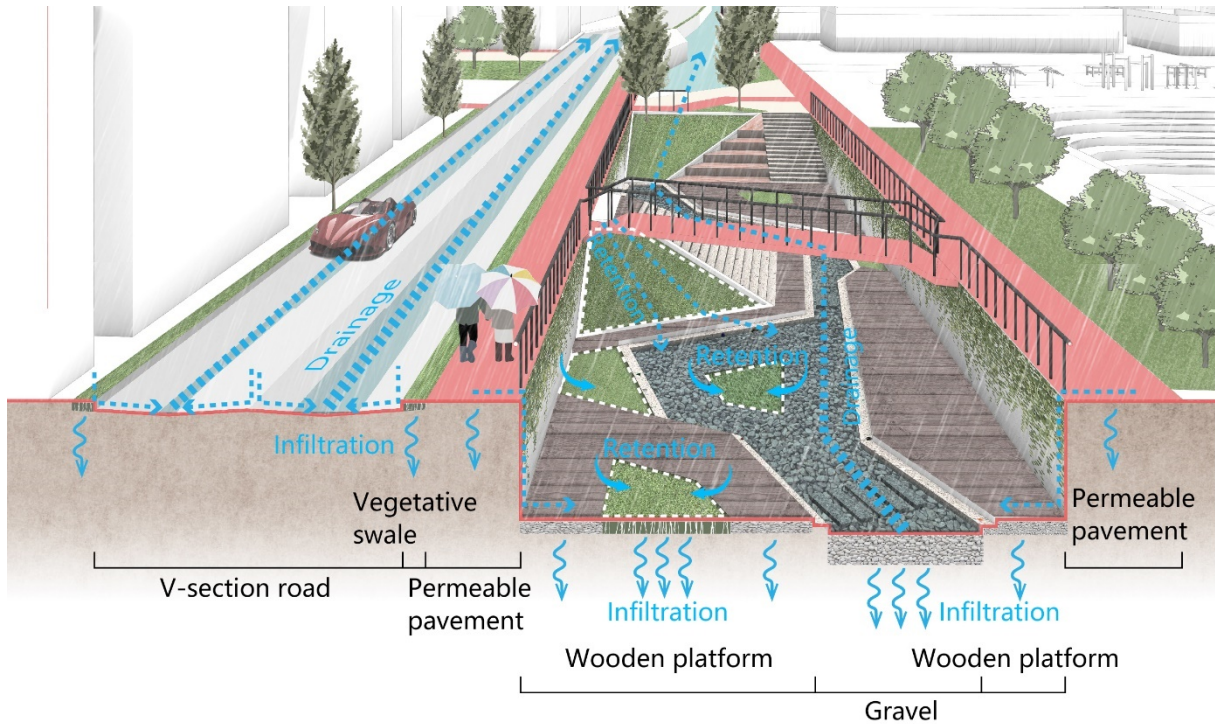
Resilient stormwater management mechanism of inundated area street
